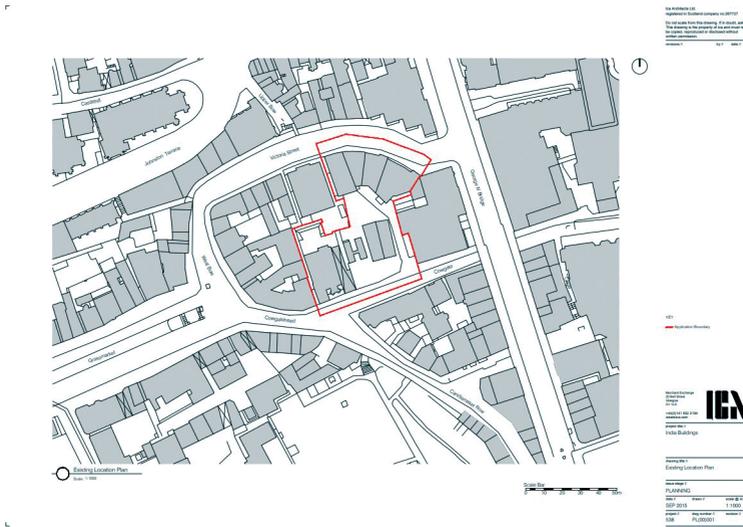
ICA location plan of the project. (Source 15/04445/FUL | Mixed-use development comprising hotel, bar, restaurant, cafe, retail and commercial uses and alterations to India Buildings, 11-15 Victoria Street and Cowgatehead Church. | 1 -15 Victoria Street 18-20 Cowgate Edinburgh EH1 2EX., <https://citydev-portal.edinburgh.gov.uk/idxpa-web/applicationDetails.do?activeTab=documents&keyVal=NV8SY2EWH1J00>)
